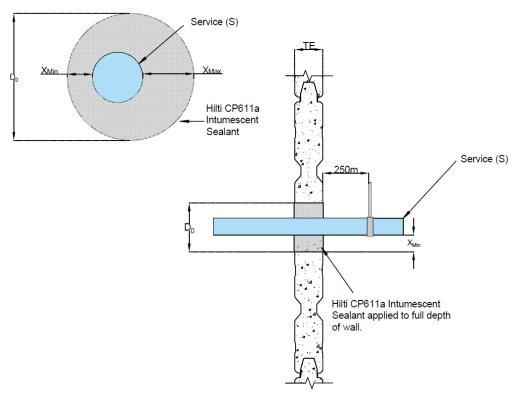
Gas and water supply pipes through 51 mm and 78 mm Korok wall system
